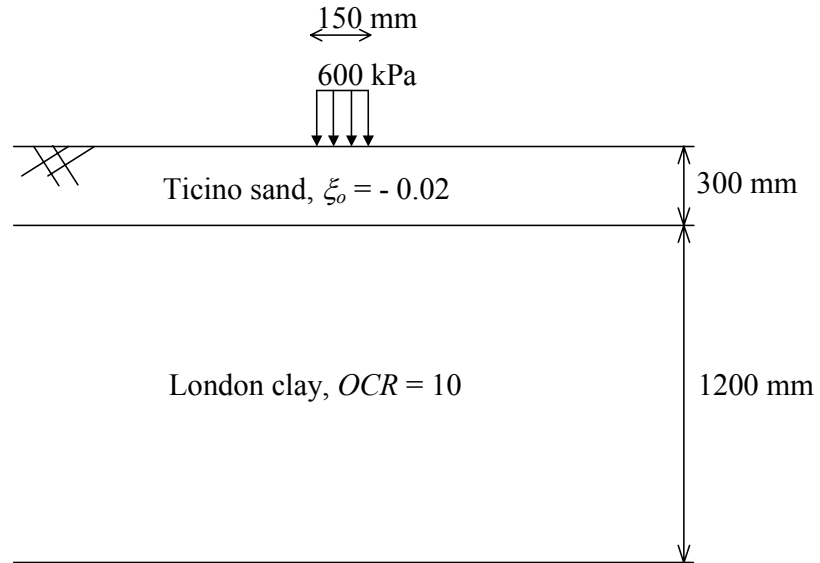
Layout of the pavement problem with 300 mm of sand
